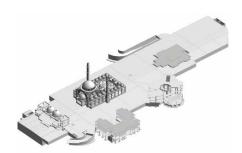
The TACC facilities have a footprint of 225,000 ft2 (20,900 m2). An underground parking structure provides the foundation for much of the center
